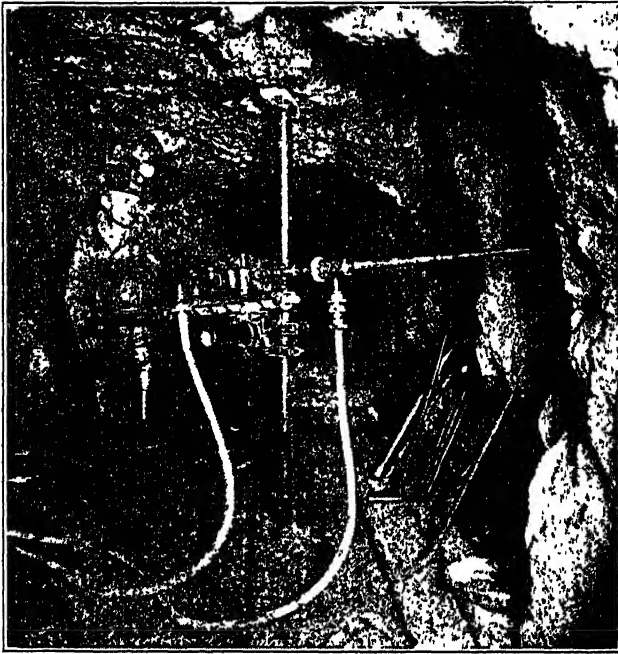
LIGHT DRIFTER DRILLING A 100-150 FT. HOLE AT EUREKA HILL MINE OF THE CHIEF CONSOLIDATED; THIS TYPE MACHINE HAS A DEPTH RECORD OF 200 FT.
